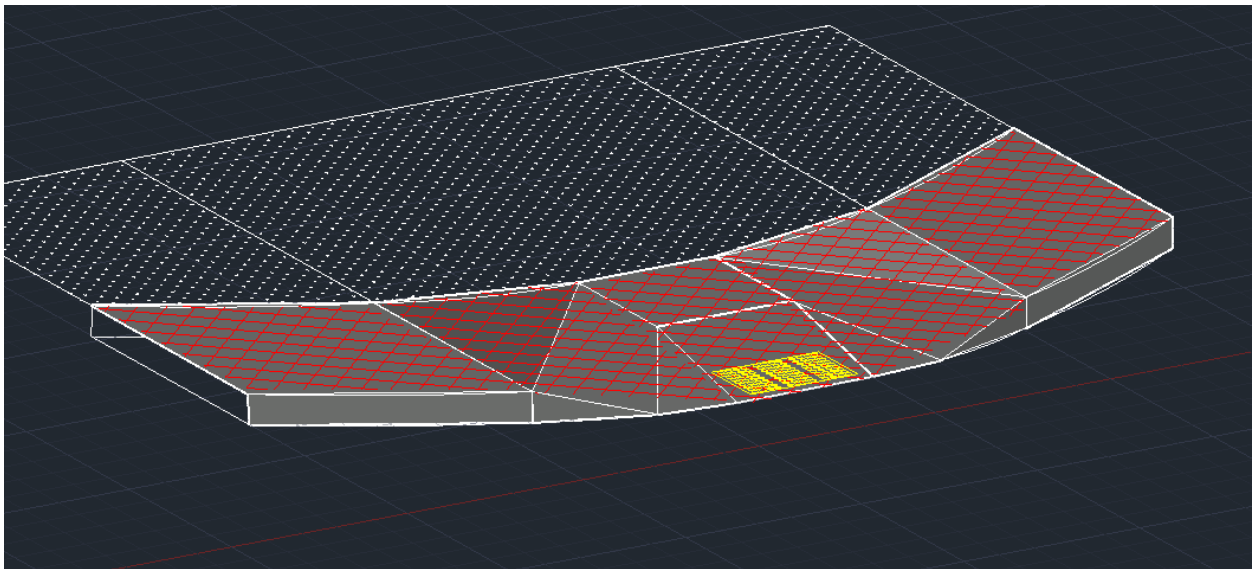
Proposed AutoCAD model of Curb Ramp i at Intersection A.
